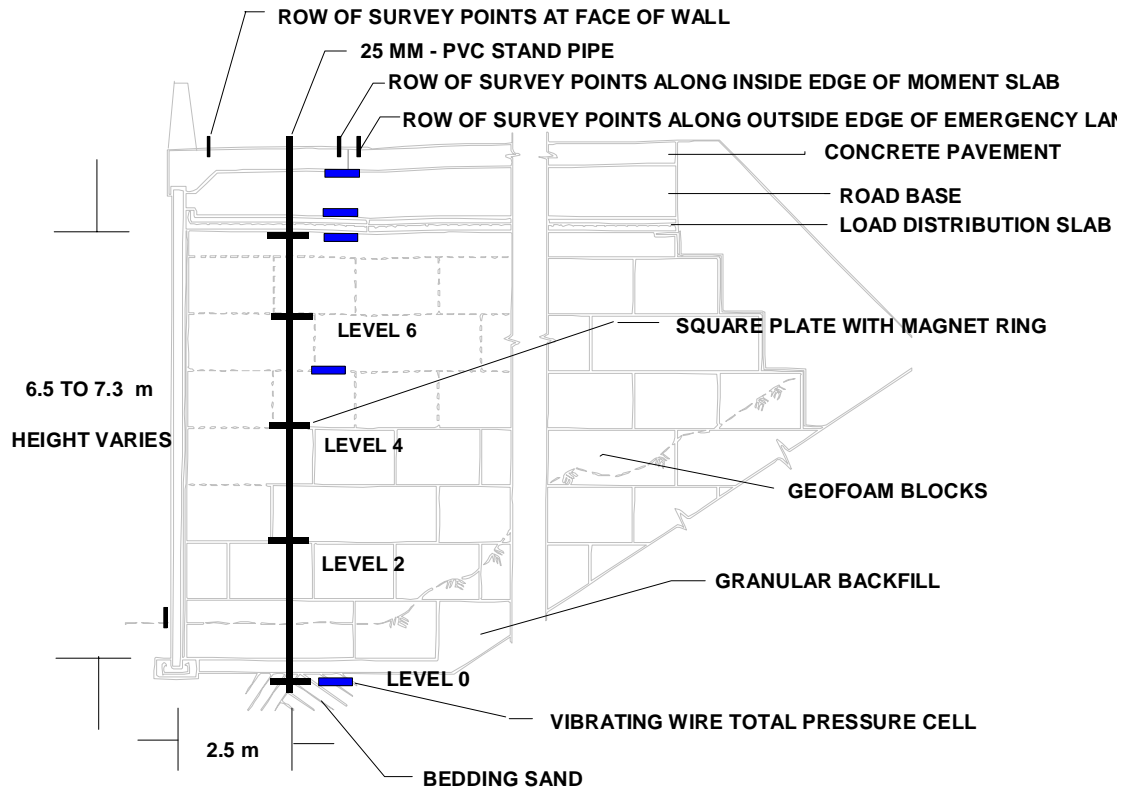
Typical Instrumentation Layout (Profile View) for the 33rd South Geofabric Array.
